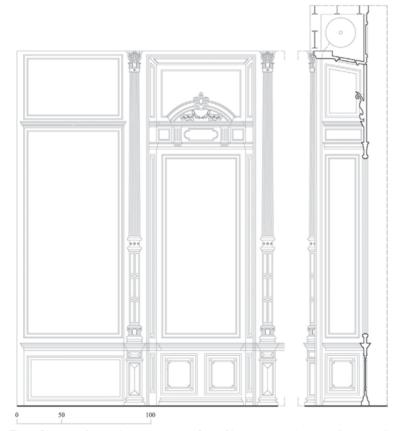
Shop window with access opening framed by cast iron columns and protected by exterior roller shutter. Façade and cross-section detail. 6-8, Bărăției Street. (ANDMB, PMB Collection, Technical Service, file 46/1888, f. 175 – redrawn).
